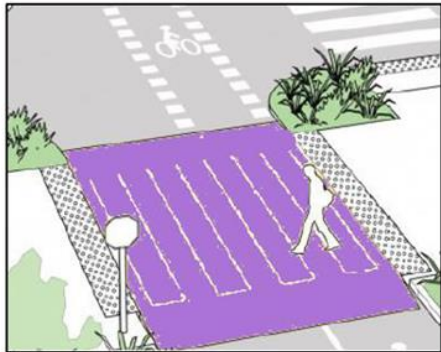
Signage and Pavement Marking– Textured Crosswalk
